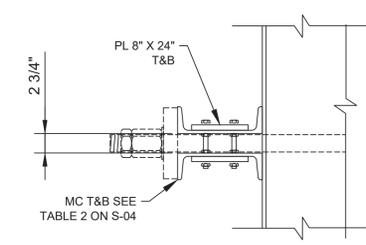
CORNER CONNECTOR ALTERNATIVE B
